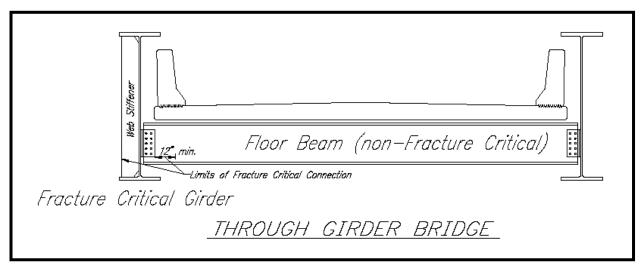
4-3: Fracture Critical Connection at Through Girder
